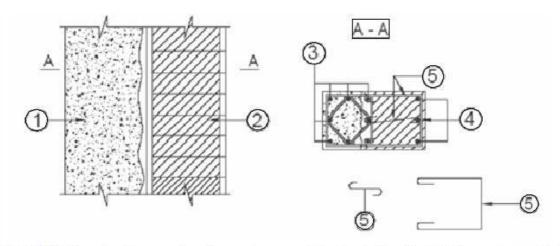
Repair of concrete columns by one-sided jacketing (1. Existing column; 2. Jacker; 3. Existing Reinforcement; 4. Added Longitudinal Reinforcement; 5. Added ties)
